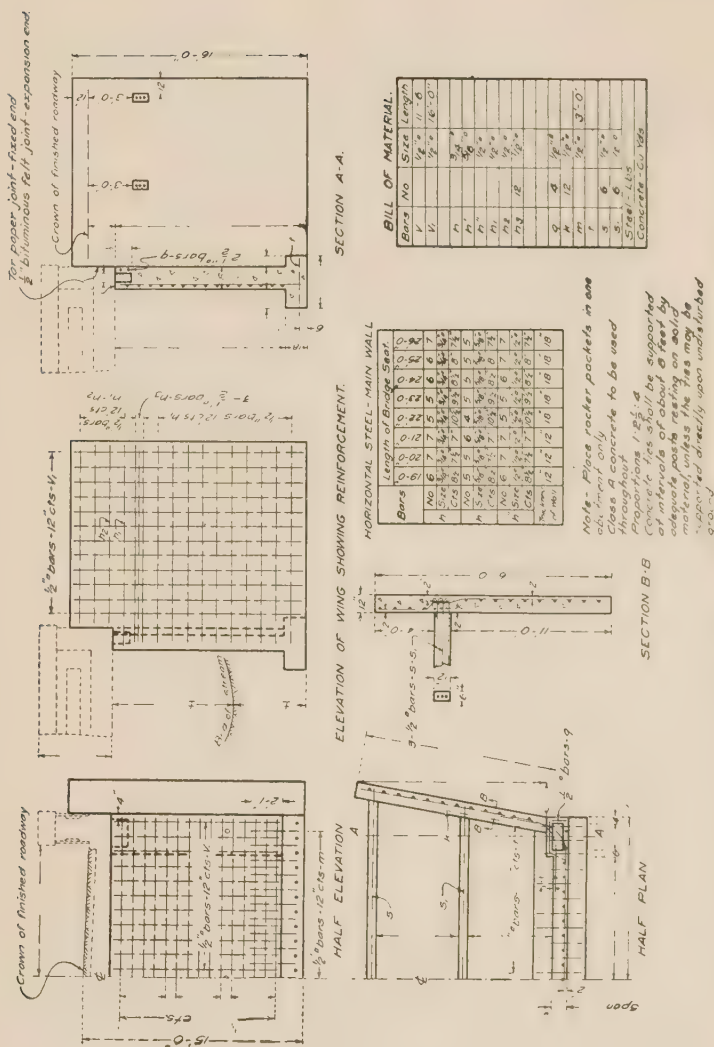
Reinforced concrete abutment for girder bridge, Illinois State Highway Department.
